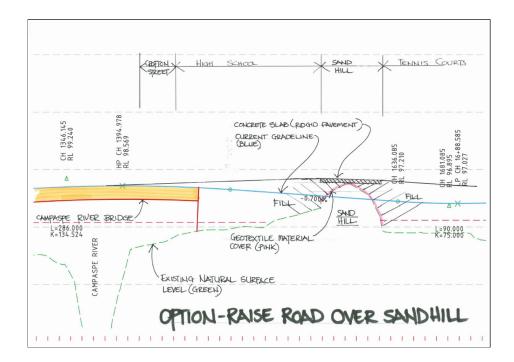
Proposed design for the elevated road across the sandhill (refer to Map 30 for location)
